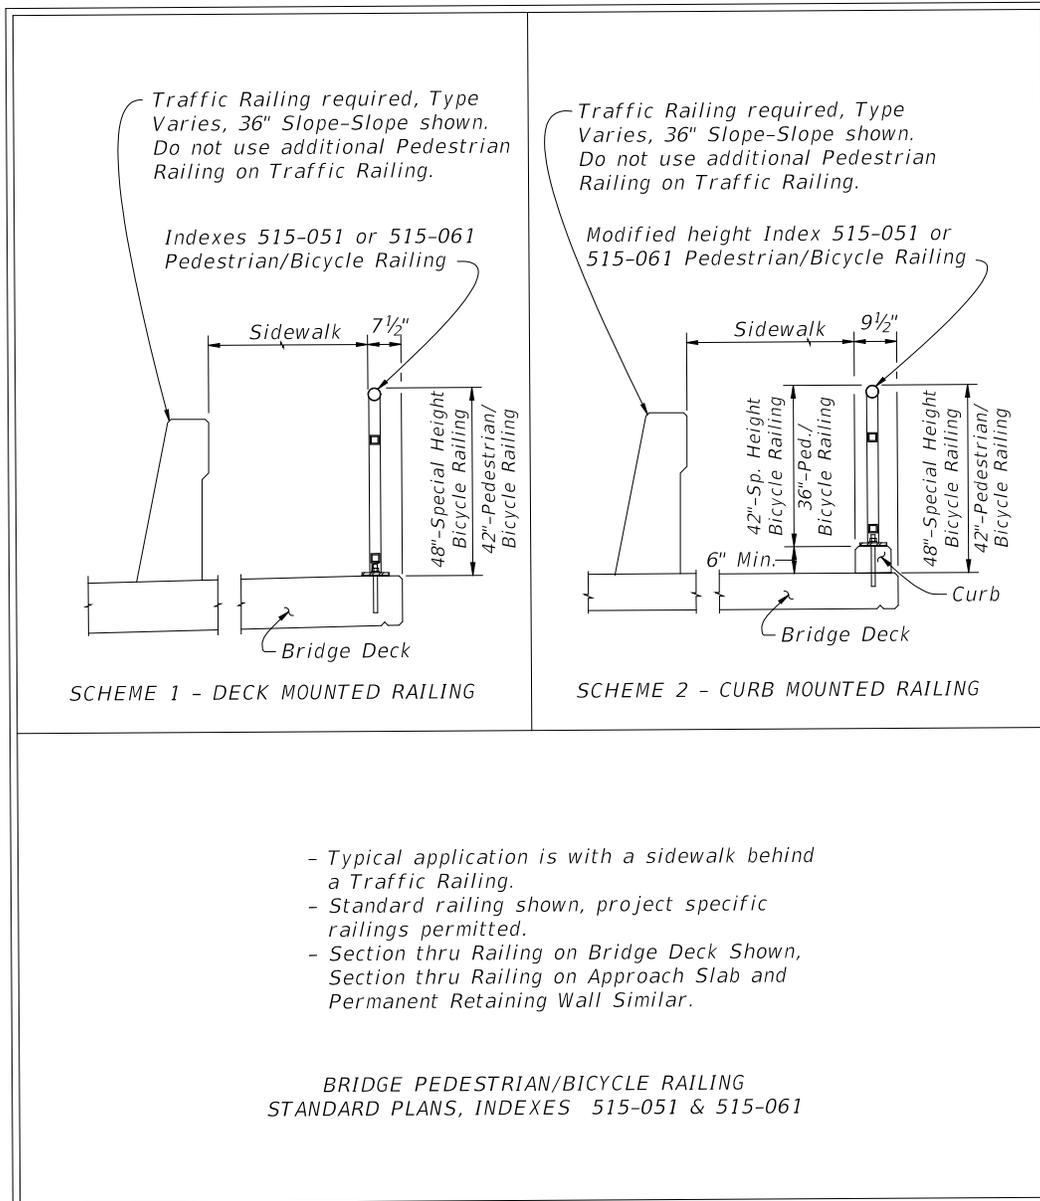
Bridge Railing – Pedestrian/Bicycle Railing
